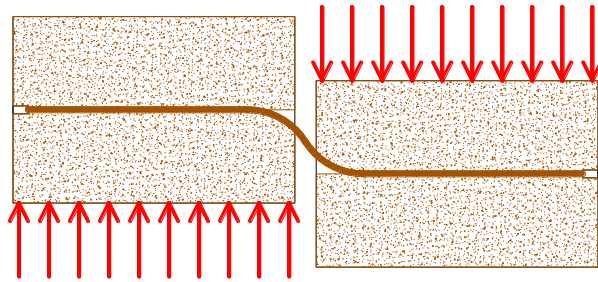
Laboratory shear test sample with a suitable anchorage length to allow the occurrence of bolt de-bonding and bolt failure
